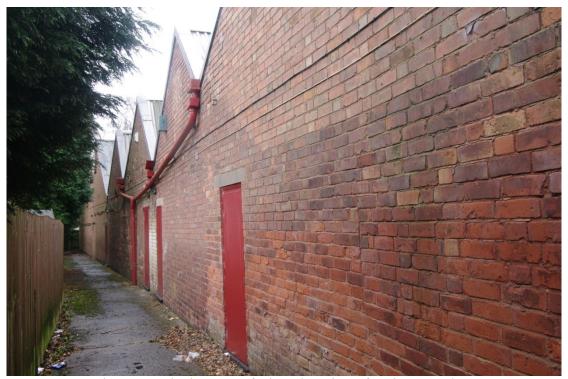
Block B, east facing elevation of Units 13 and 14 Looking south. Unit 14 is the closest gable, Unit 13 is the next two gables
